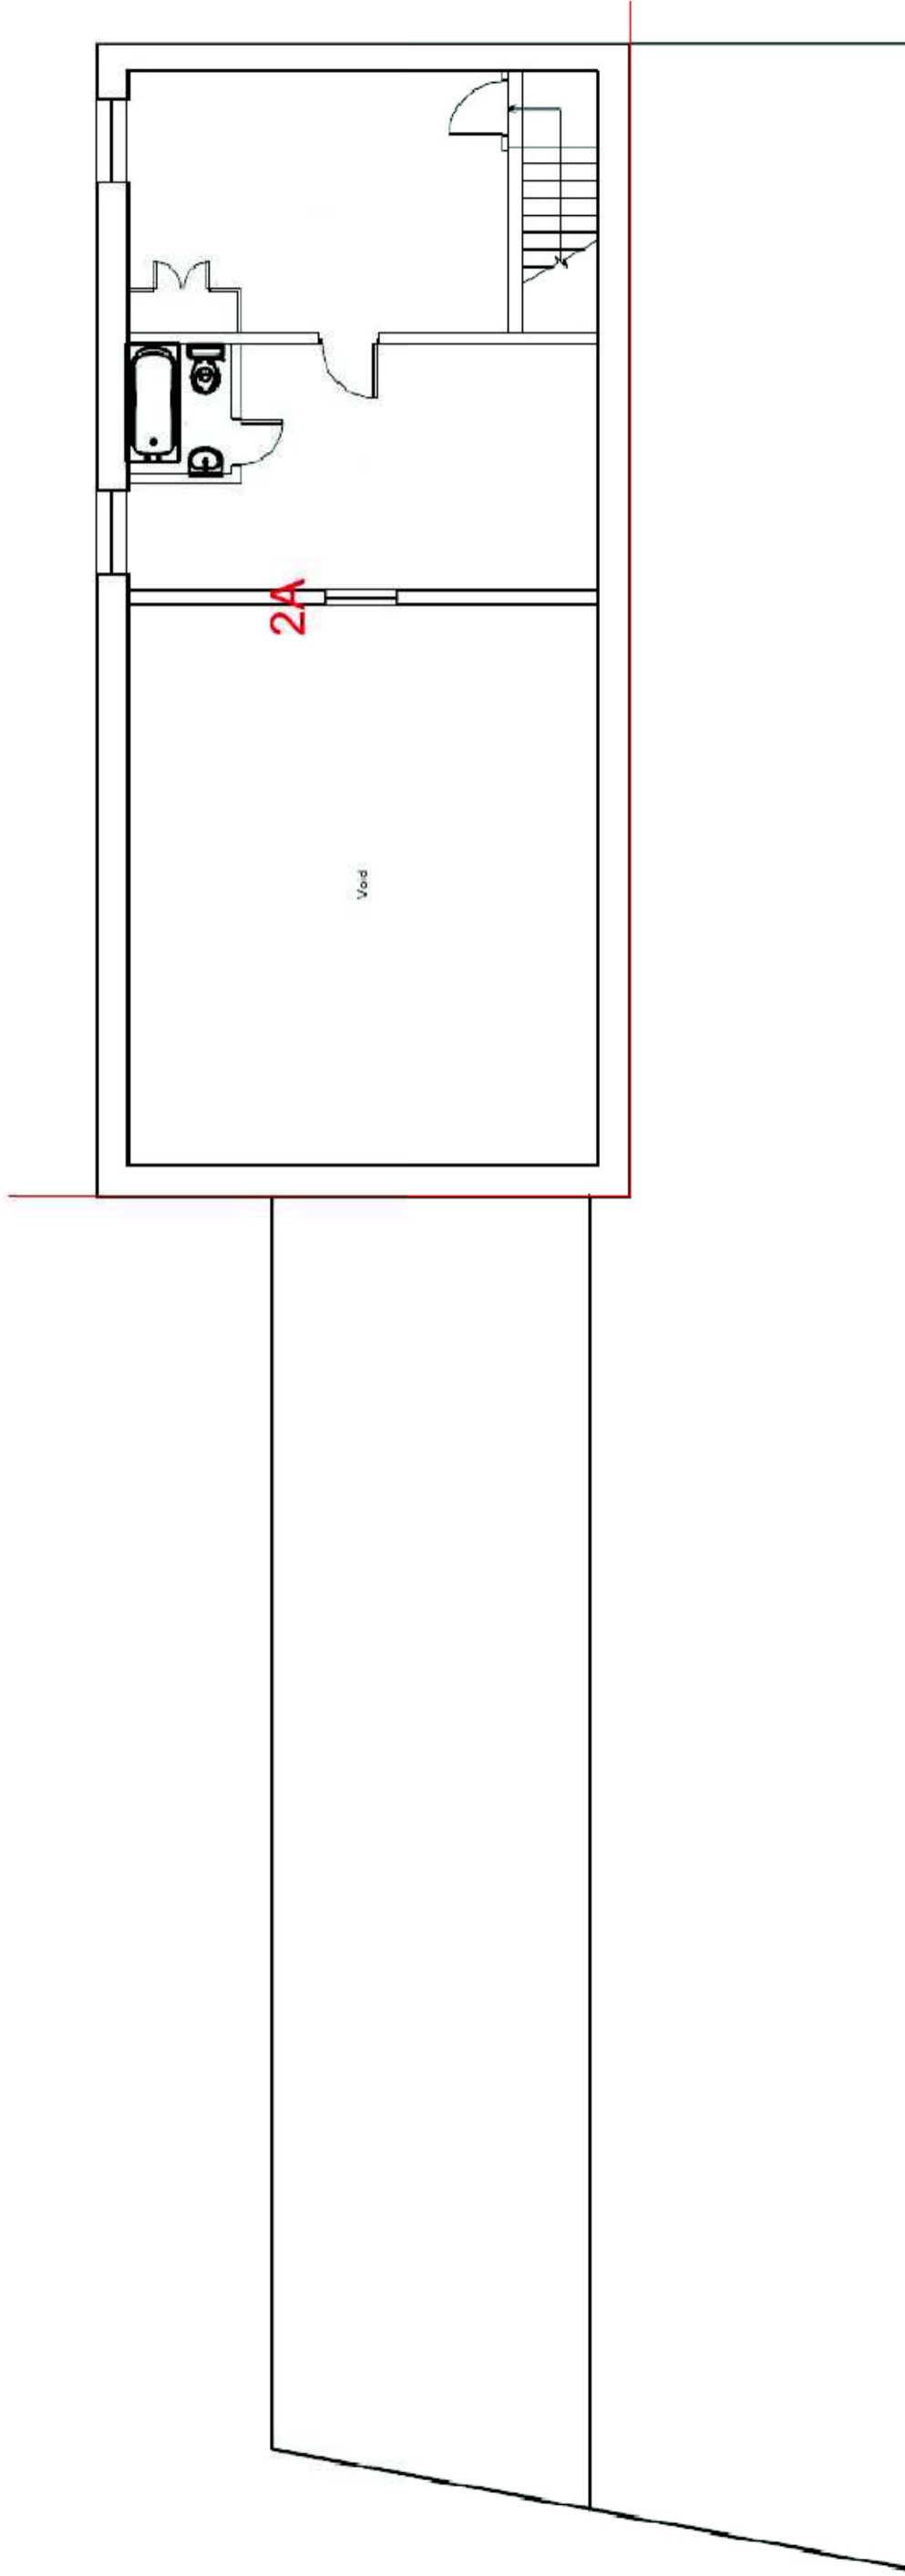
First Floor Plan, building 2, 1:100 @ A3
